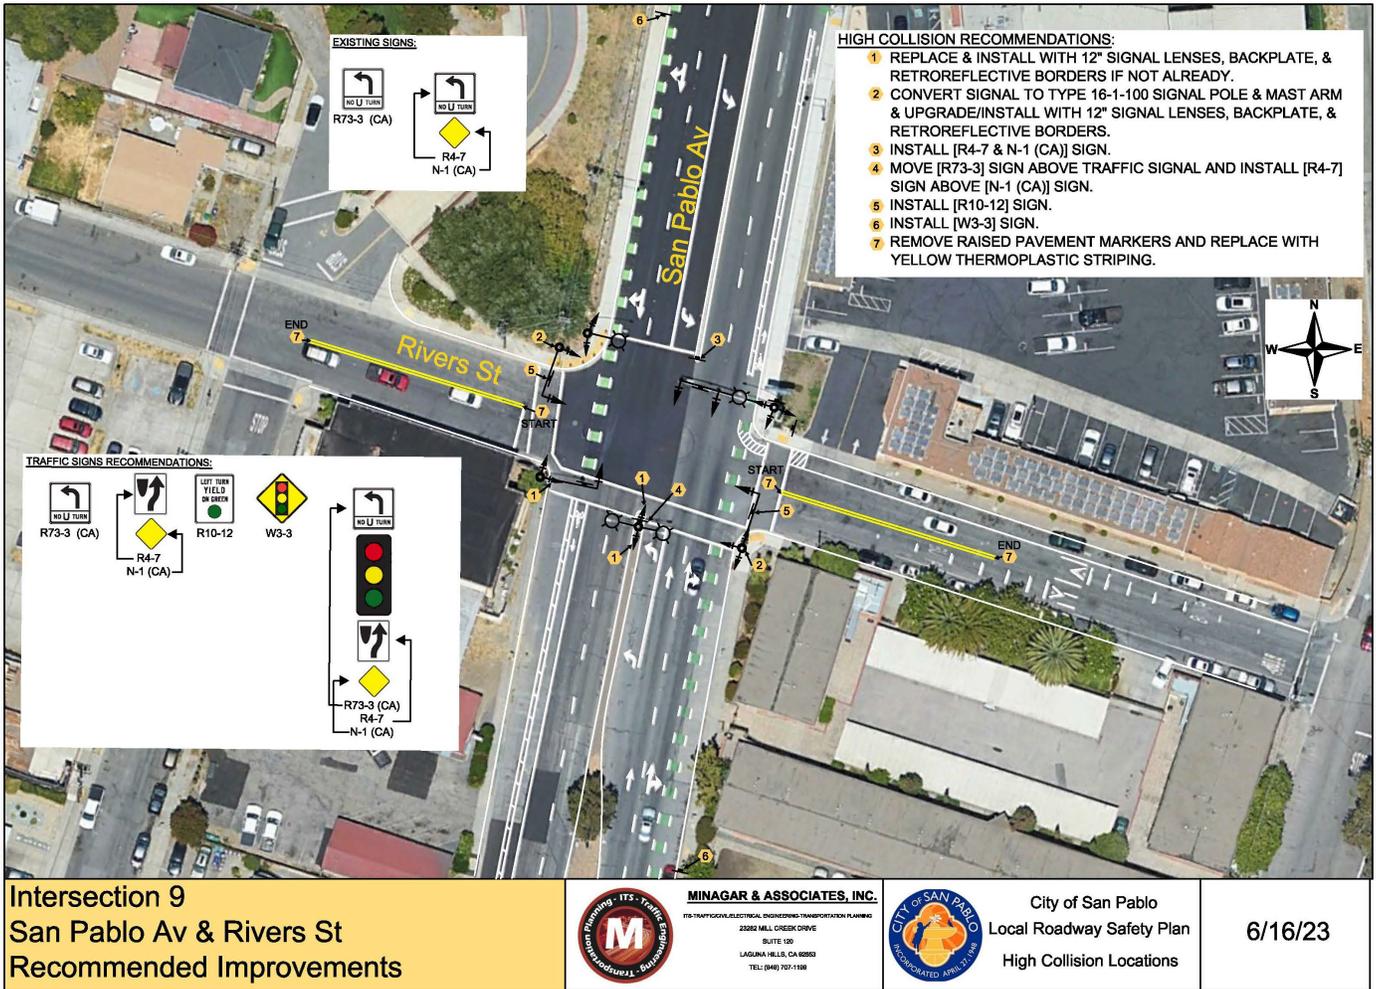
Intersection 9- San Pablo Av & Rivers St Recommended Improvements
